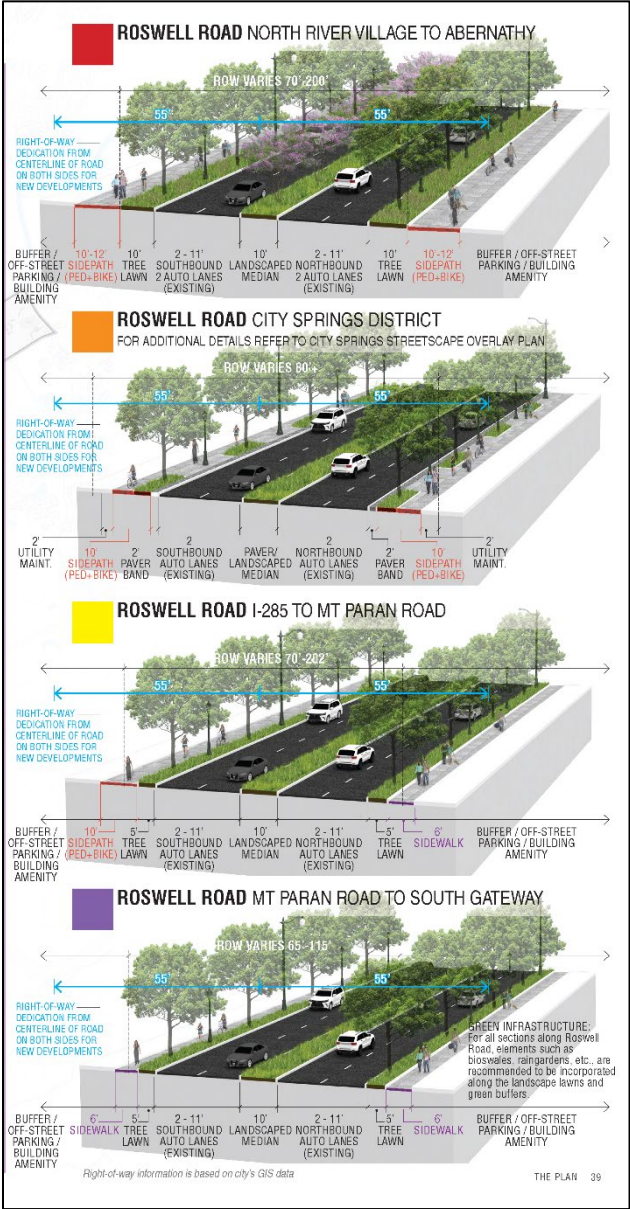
Typical Sections from the Roswell Road Small Area Plan
